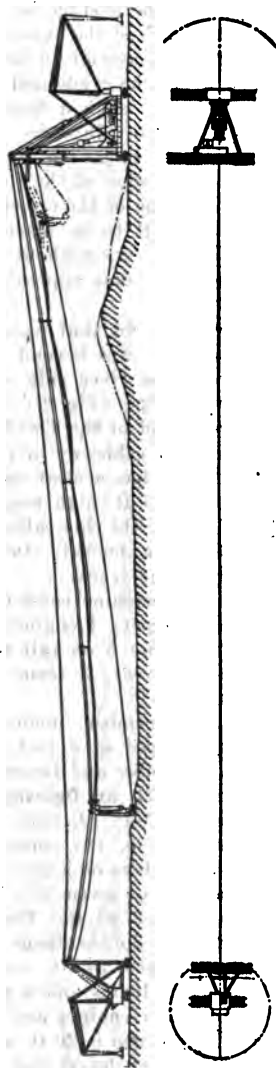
Lidgerwood Dragline Cableway Excavator Used to Build Mississippi Levees.
